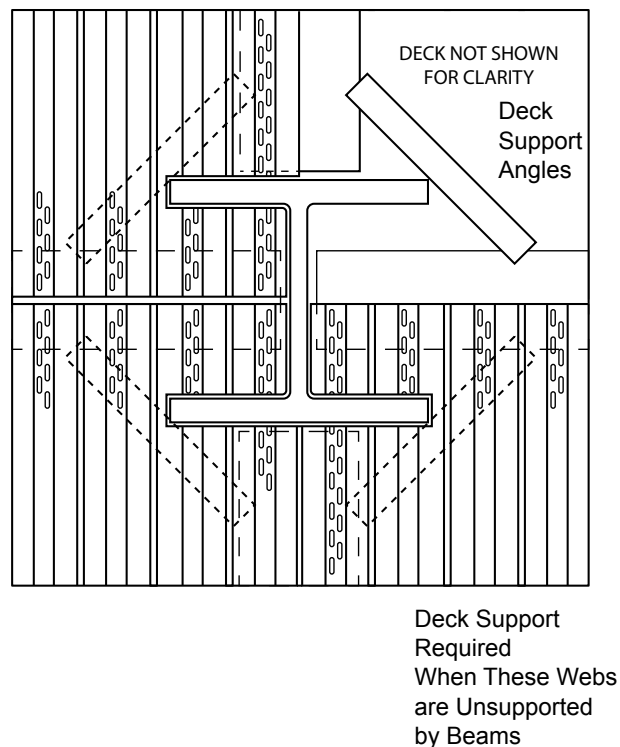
COLUMN DETAIL REQUIRING DECK SUPPORT ANGLES
